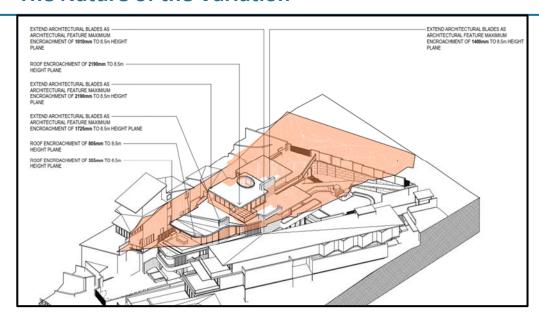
Building Height Plane diagram using existing ground level (RL3.8m AHD – floor level of lower ground floor level)
